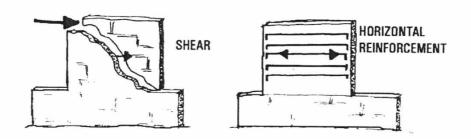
FAILURE AND REINFORCEMENT OF SHEAR WALL SECTIONS
